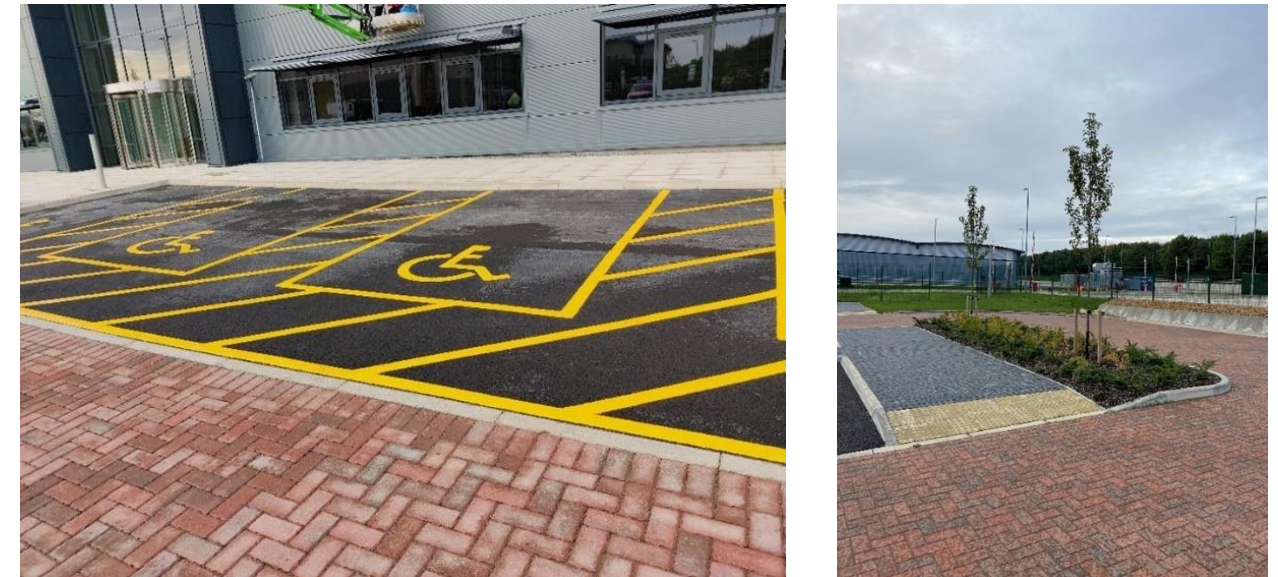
Accessible parking adjacent to the Main entrance and drop kerb / level crossing detail within the car park
